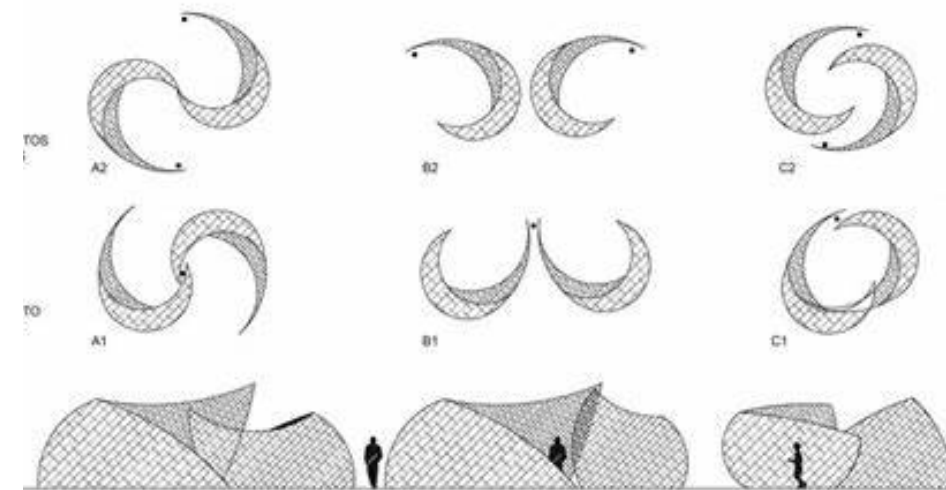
PLAN AND ELEVATION (FURUTO, 2012)
